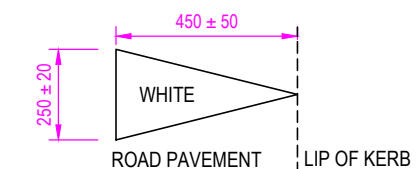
H: ROAD PAVEMENT HYDRANT REFLECTIVE PATCH
